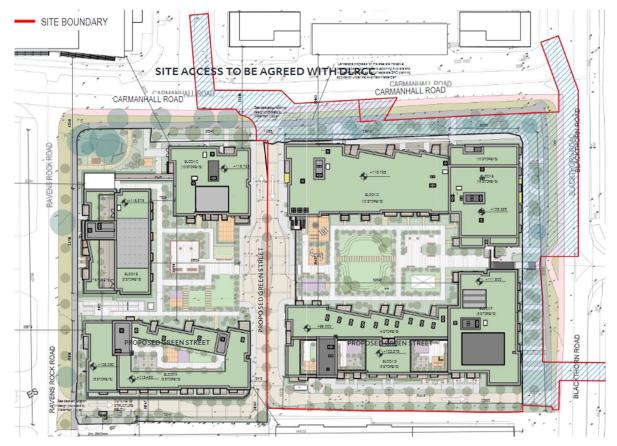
Proposed site plan with red line boundary showing overall masterplan with adjoining 'Tack' Site. Source: McCauley Day O'Connell Architects
